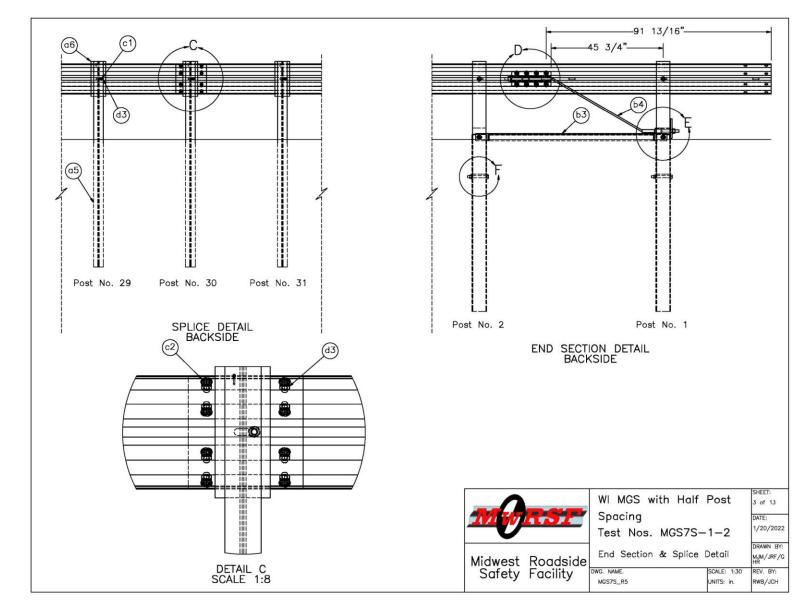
End Section and Splice Detail, Test Nos. MGS7S-1 and MGS7S-2
